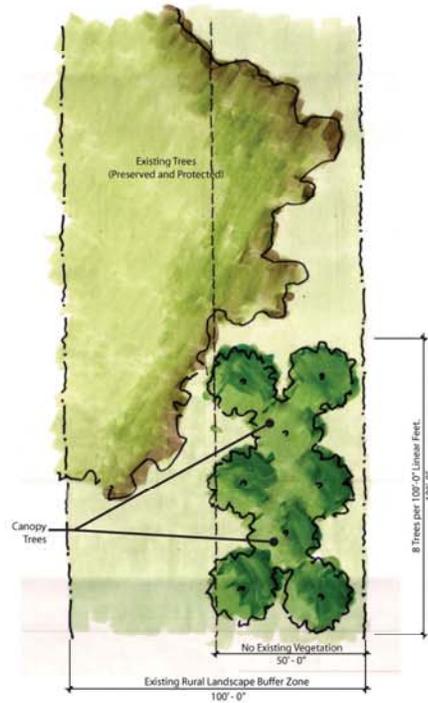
Recommended 100 Foot Rural Enclave Plan View Option 1
